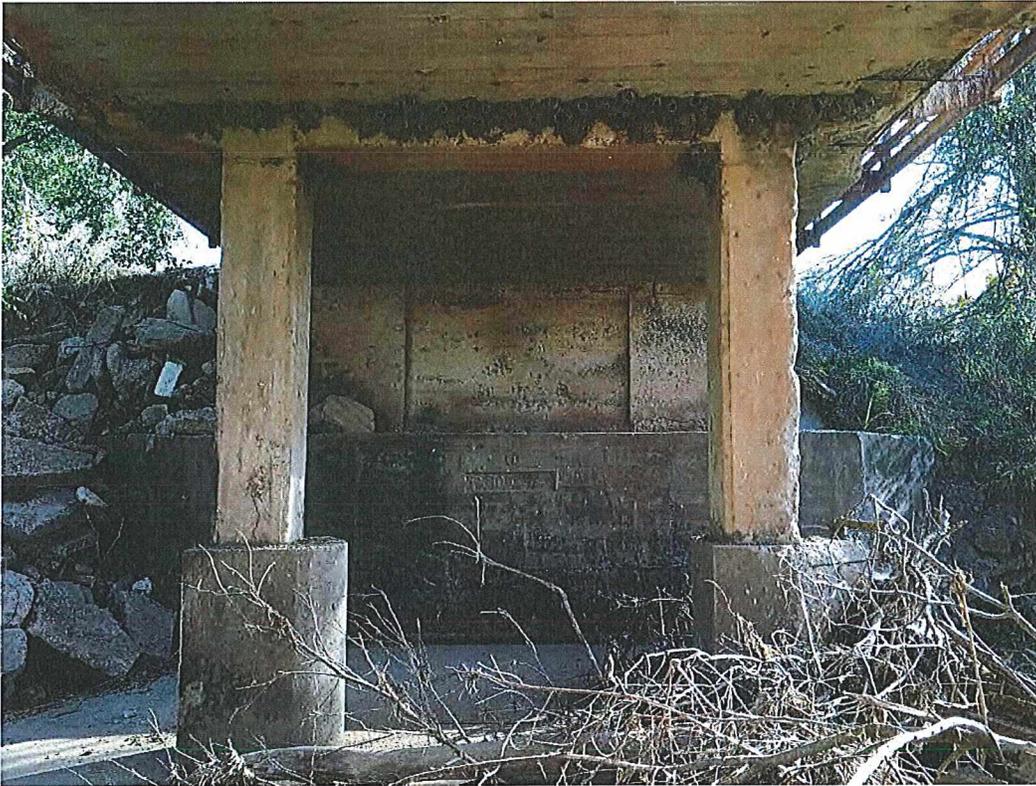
looking at the south abutment and retaining wall with POW embossed impression.
